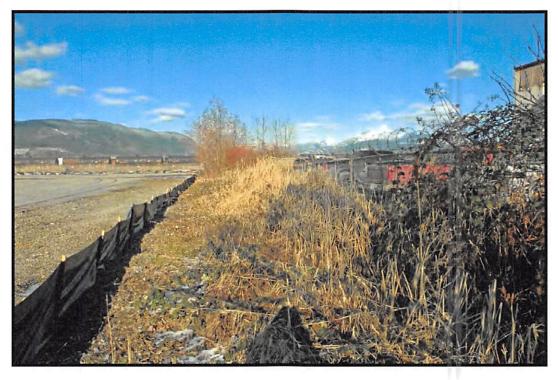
Looking east across material storage area towards Railway Ditch, east of Central Ditch (January 2, 2018).
